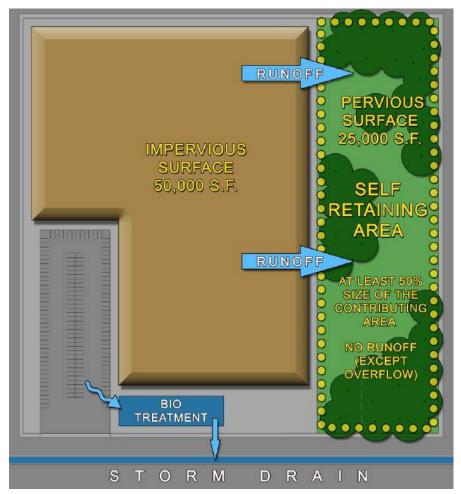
Schematic Drainage Plan for Site with a Self-Retaining Area
